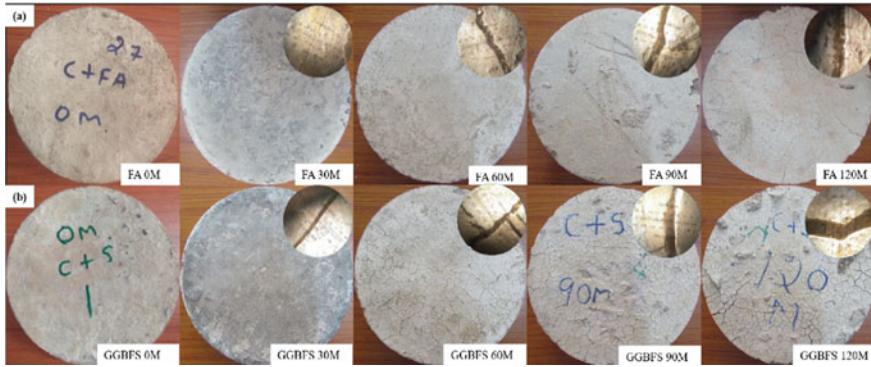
View of thermal crack width (Unheated and heated SCC specimens). a FA-SCC specimens. b GGBFS-SCC specimens
